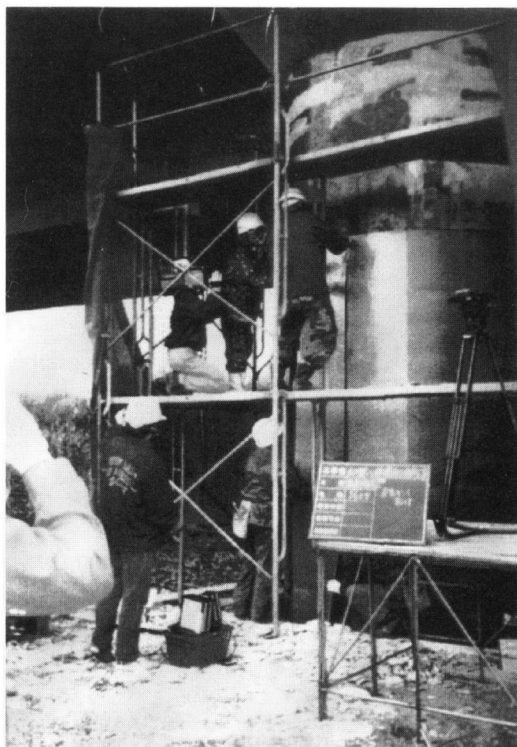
Gluing work of carbon fiber sheet for bridge column.
